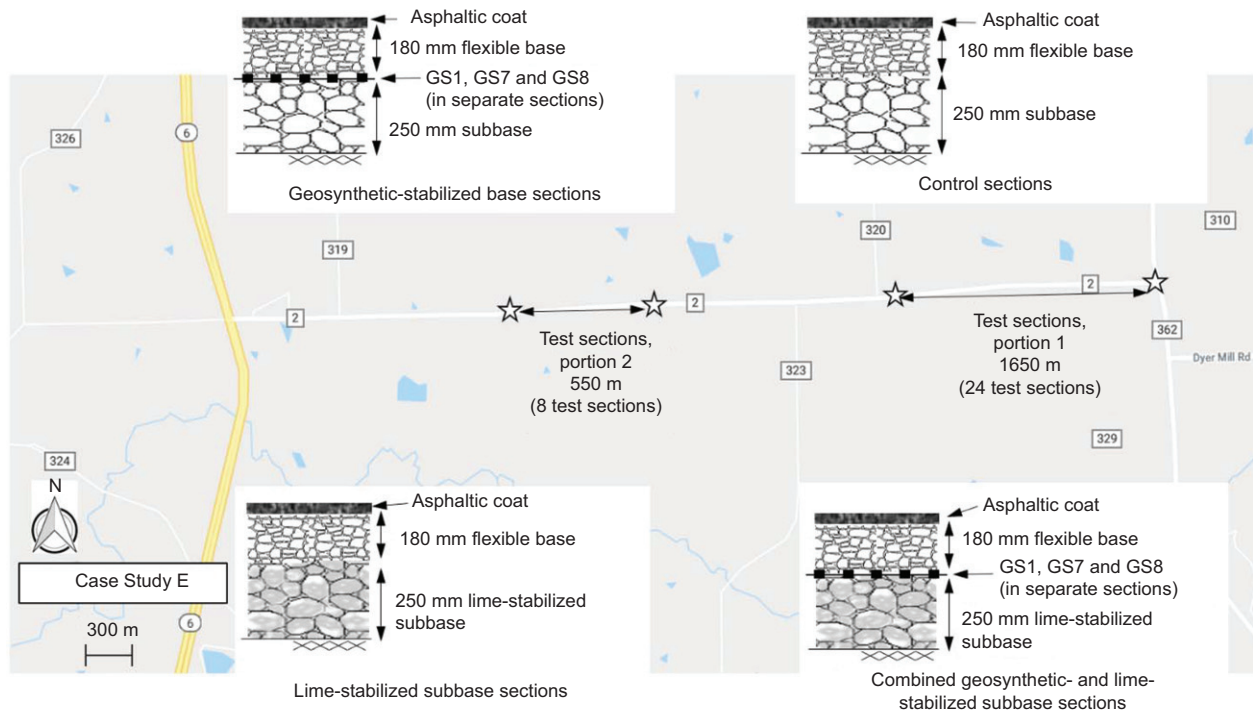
Layout of FM2 test sections and road profiles (Case Study E)
